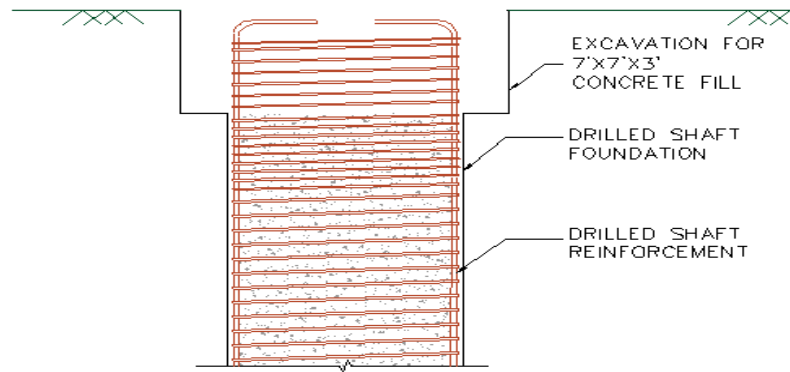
shows the placement of reinforcement cage and concrete casting by the foundation contractor.
